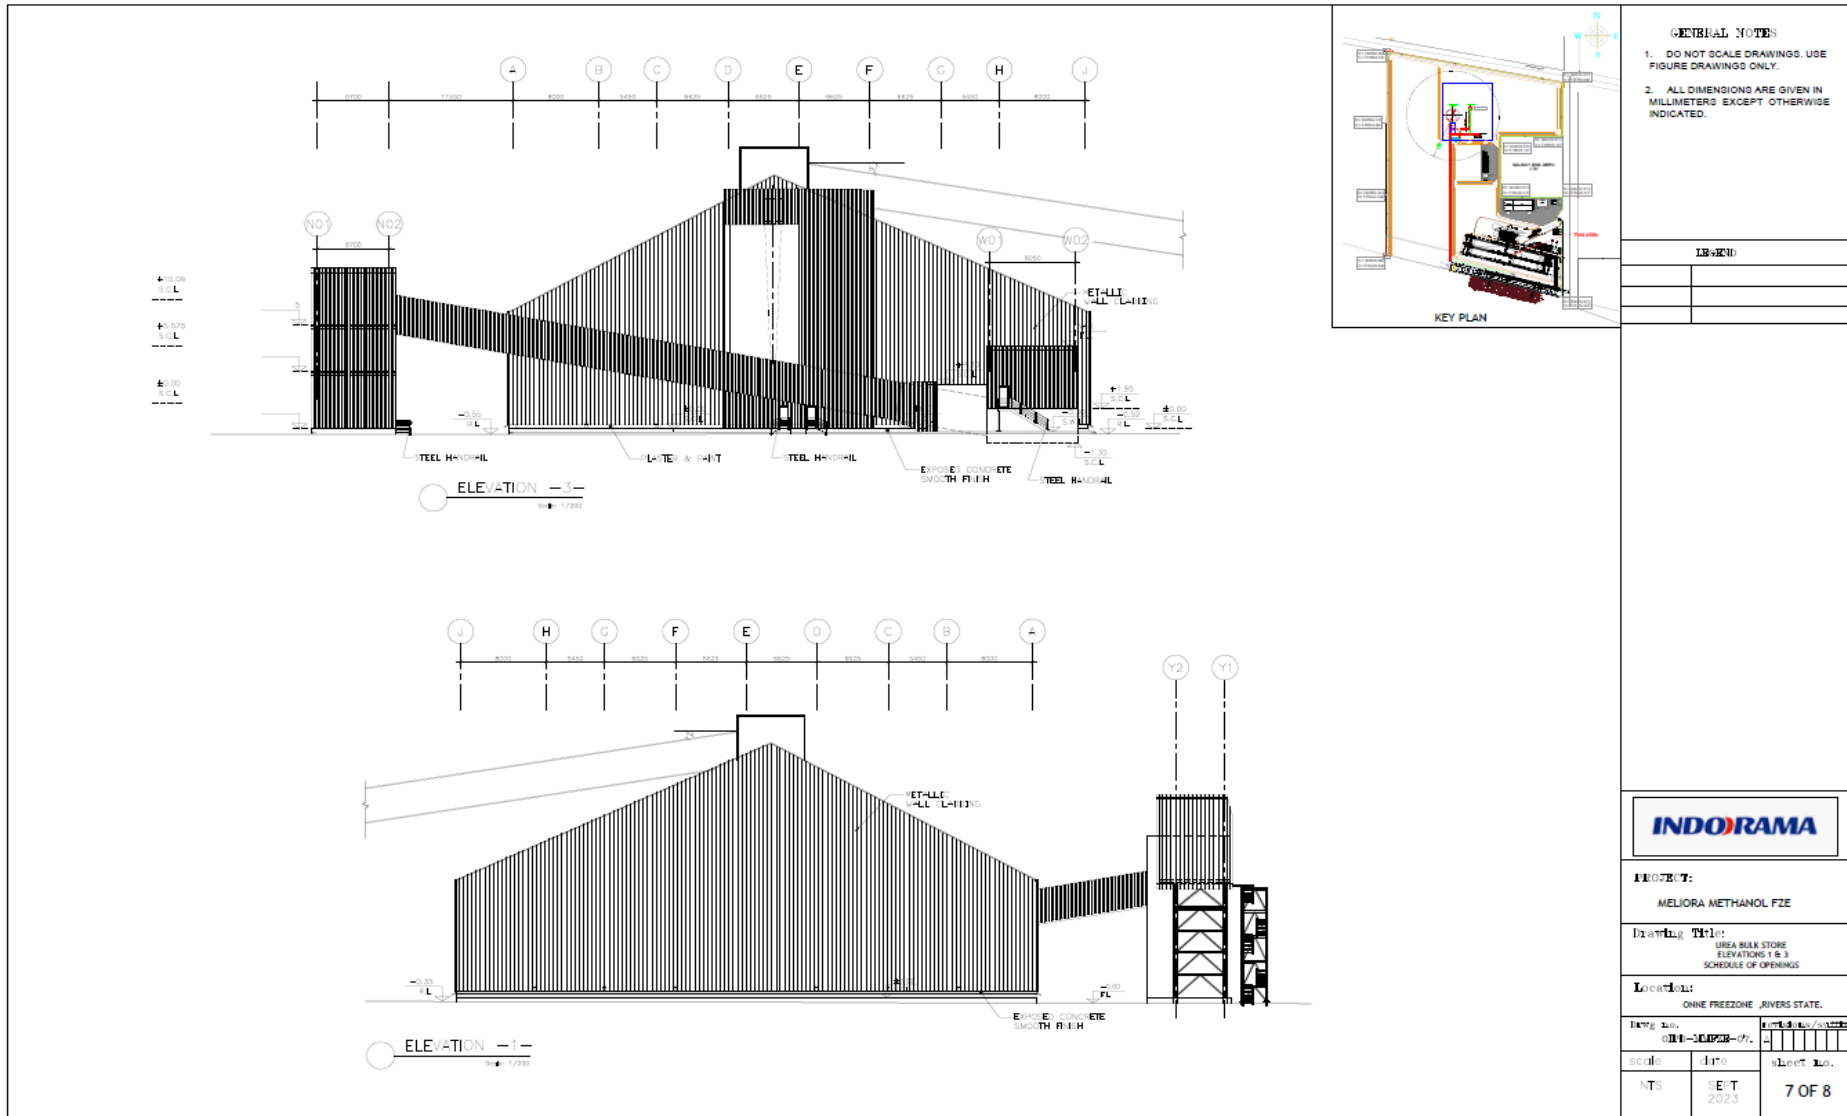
Urea Bulk Store Elevation 1 and 3
